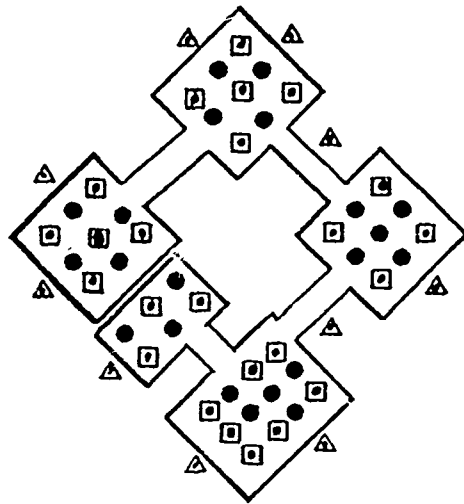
LAYOUT PLAN OF STRUCTURE
